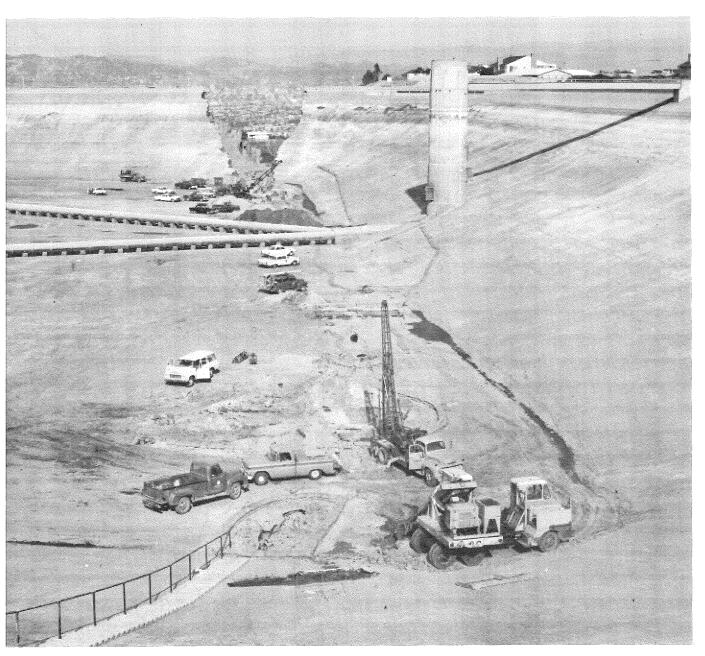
Exploratory activity at reservoir, January 6, 1964. Excavation No. 8 in foreground.
